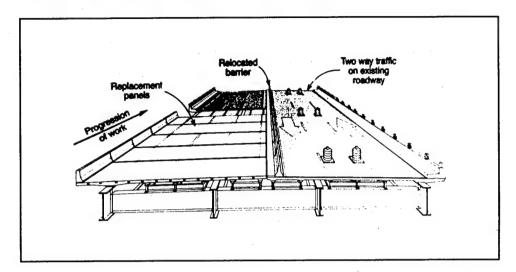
Barrier relocated at night so work on the Woodrow Wilson Memorial Bridge could continue (from ASCE 1984)
